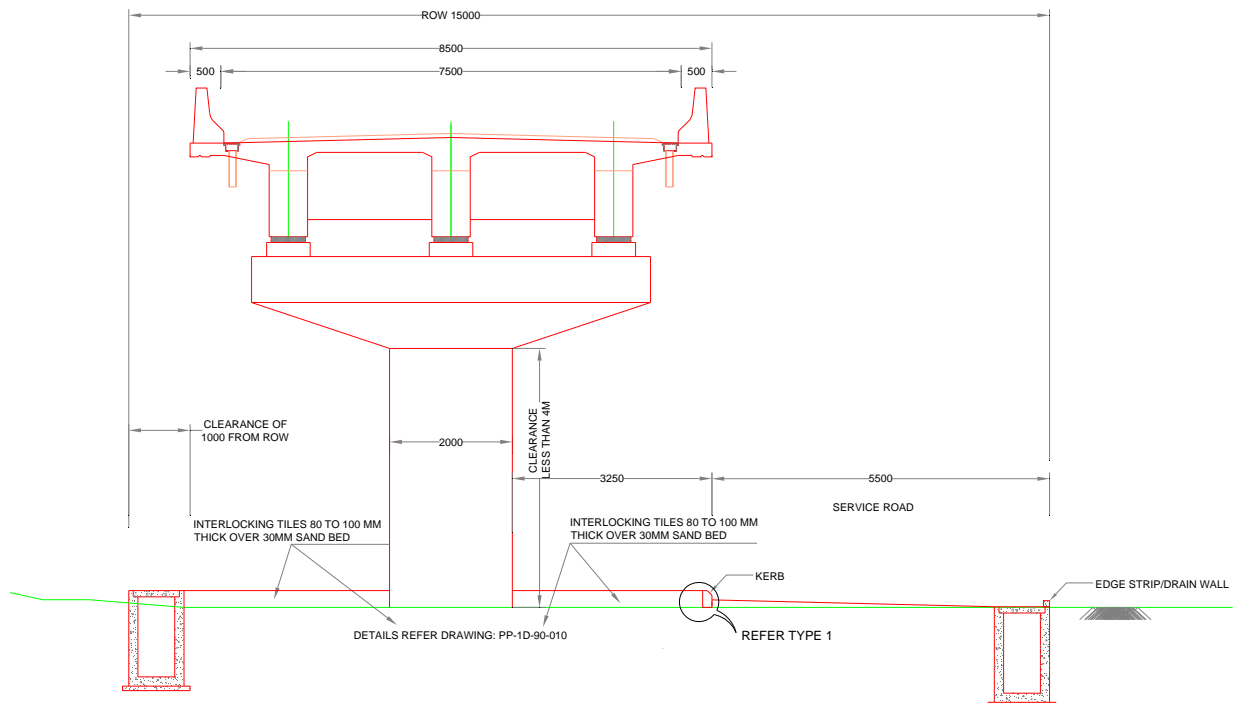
TYPICAL CROSS SECTION- TYPE-8
